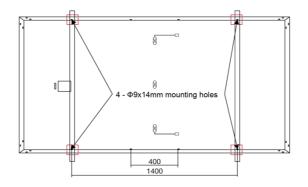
Installation with bolts into 4 outer holes, beam perpendicular to long sides
